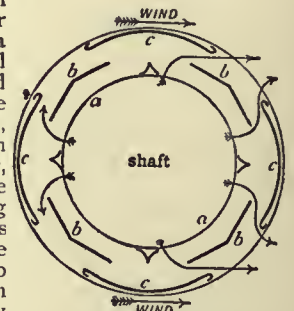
Sectional Plan of Buchan's Exhaust Cowl.
